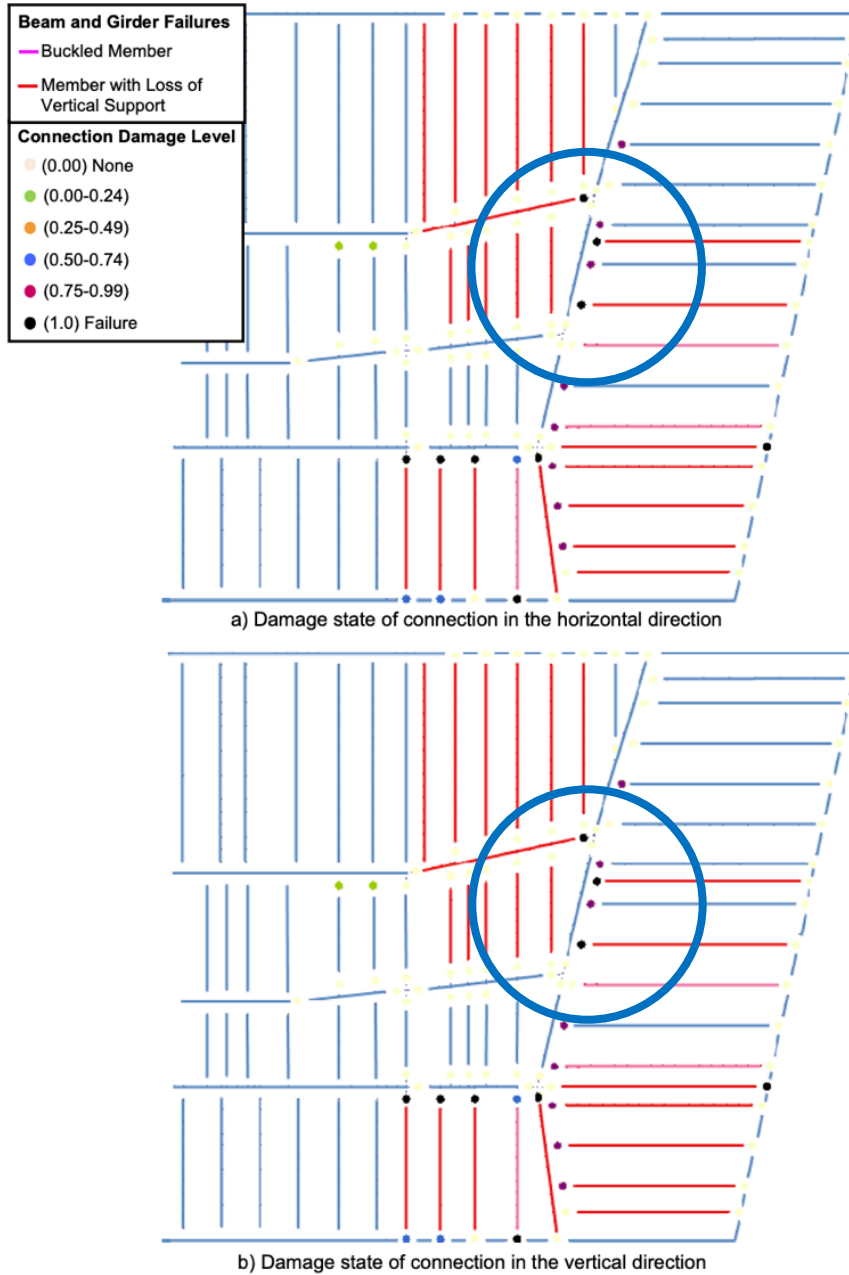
Damage state of connections, beams, and girders in Floor 12 at 4.0 h for Case B temperatures.
